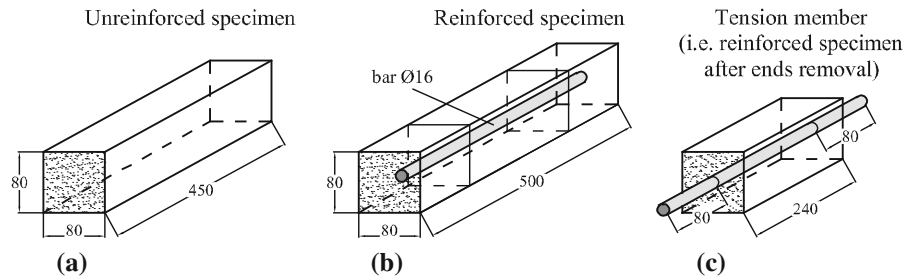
Geometry of the unreinforced (a) and reinforced (b) specimens used to investigate spalling; and geometry of the reinforced tension members used to investigate tension stiffening after the removal of concrete cover at both ends (c)
